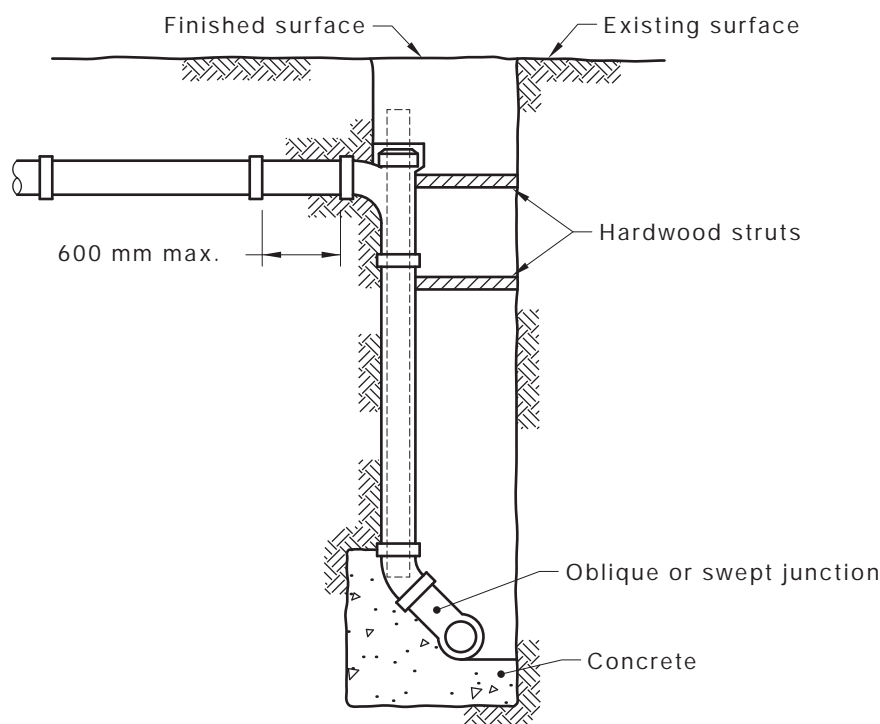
VERTICAL JUMP-UP TO BRANCH SITE STORMWATER DRAIN
